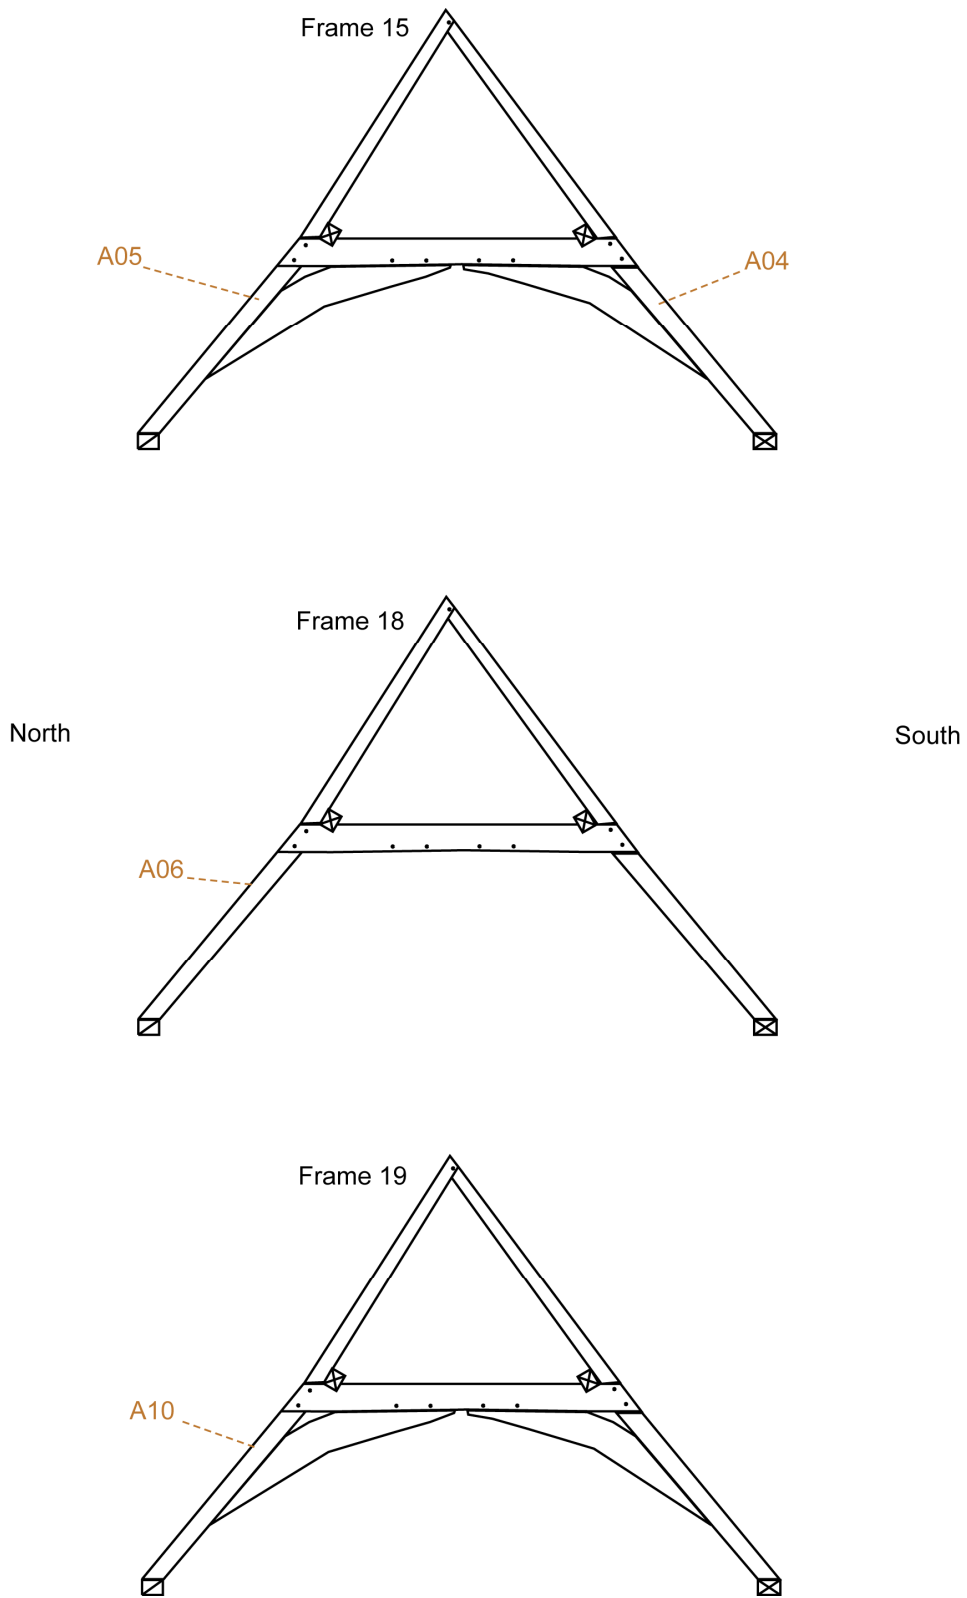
Great Chamber/cross-wing roof trusses, showing the locations of samples APT-A04–06 and A10
